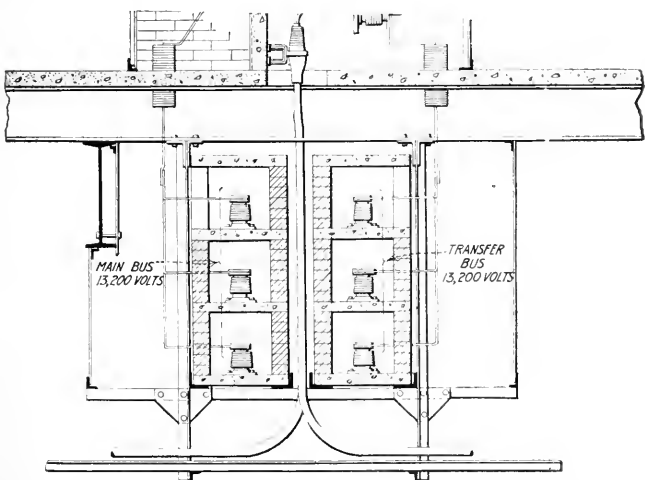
BUS STRUCTURE SUSPENDED FROM CEILING GIRDER TO ECONOMIZE IN CONNECTIONS WITH EQUIPMENT ABOVE
